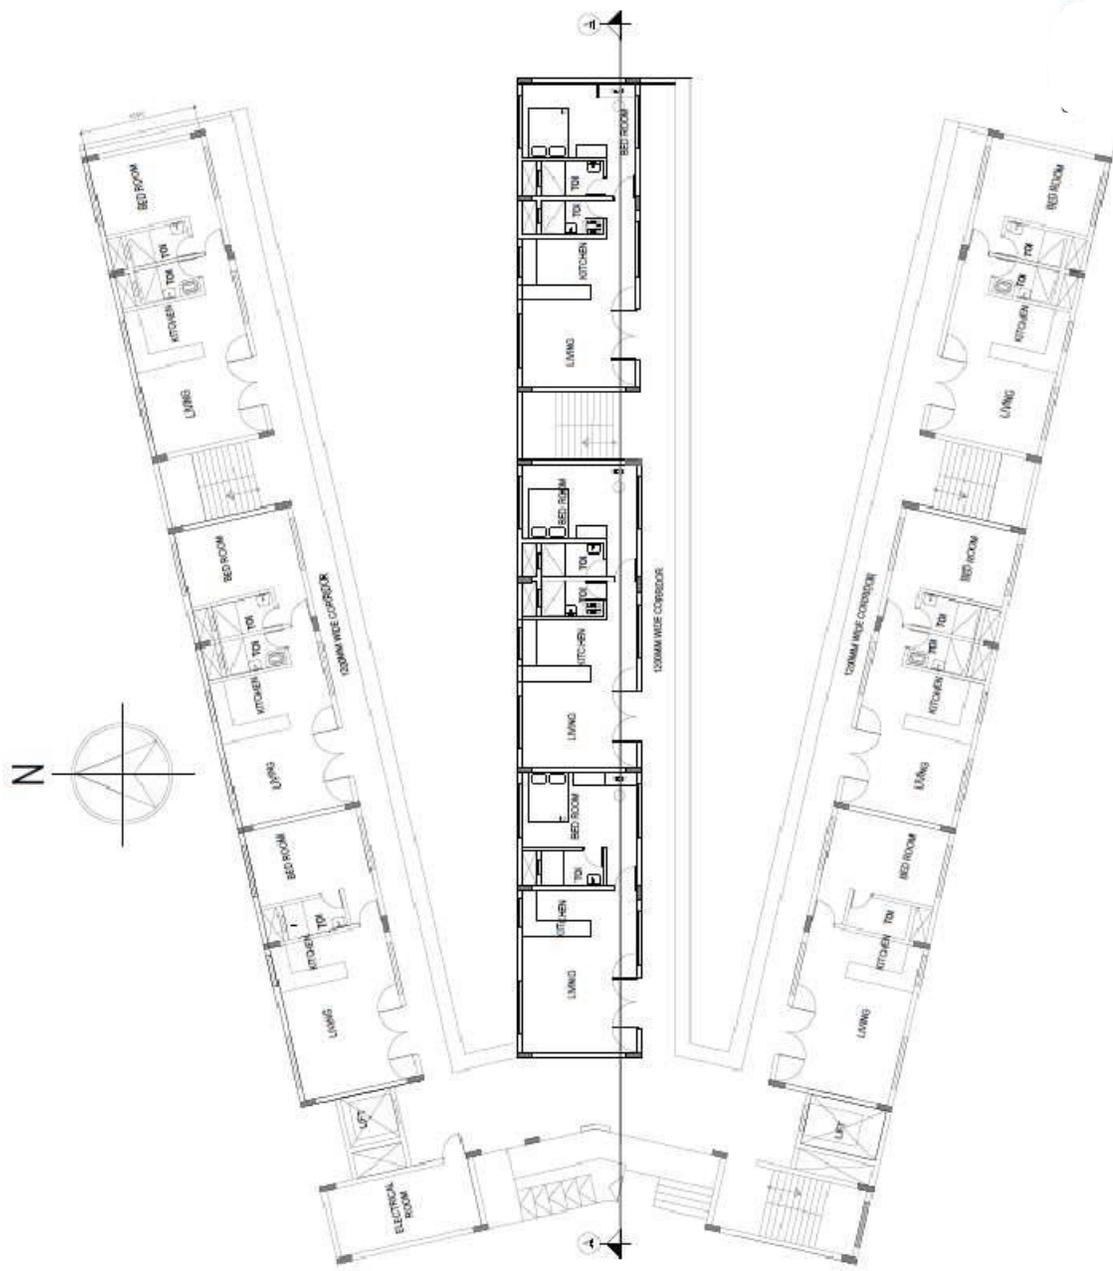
THE TYPICAL FLOOR PLAN OF LIG BLOCK -1ST TO 9TH (Source: Author 2022)
